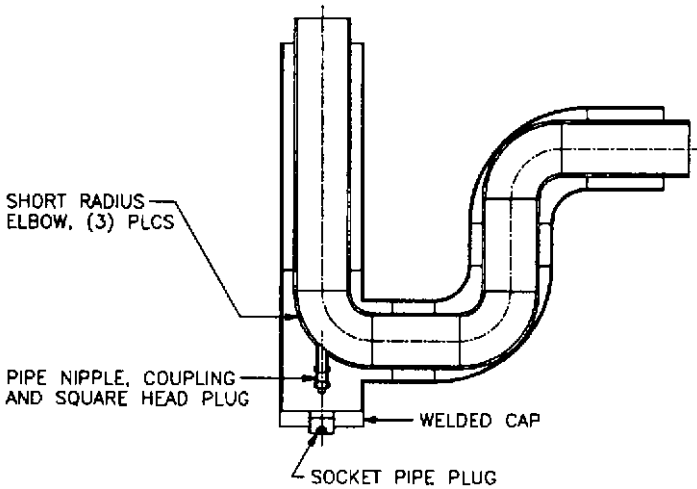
Alternative arrangement for P-traps involving carrier components housed inside a specialized secondary containment tank-like structure.
